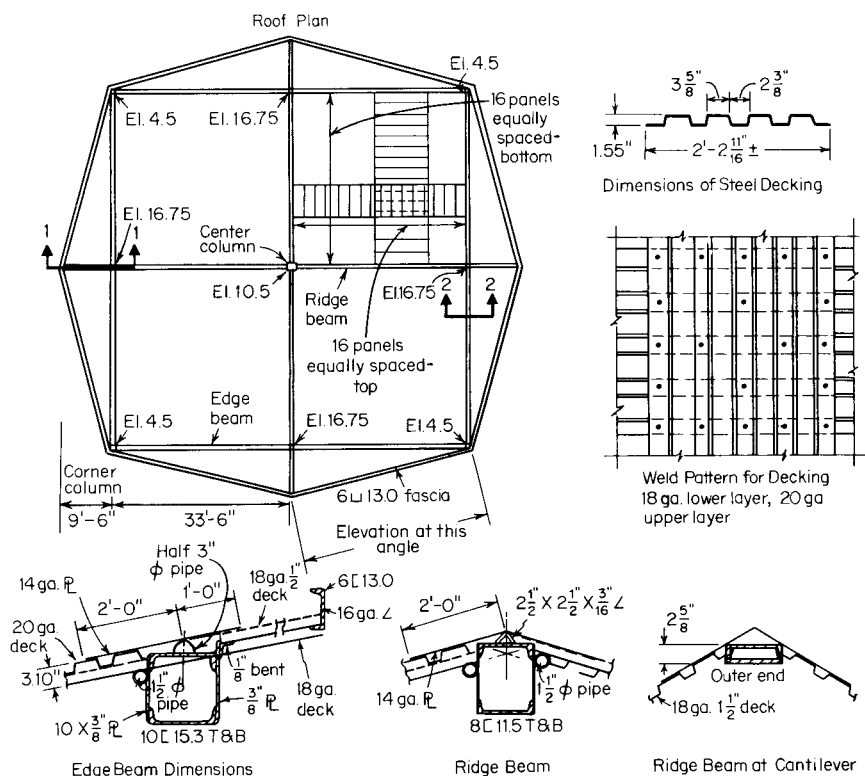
Roof plan and structural details of Frisch Restaurant, Cincinnati, Ohio, of hyperbolic paraboloid construction. (Reprinted from *Architectural Record*, March 1962, copyrighted by McGraw-Hill Book Co., Inc.)^{1,79}
